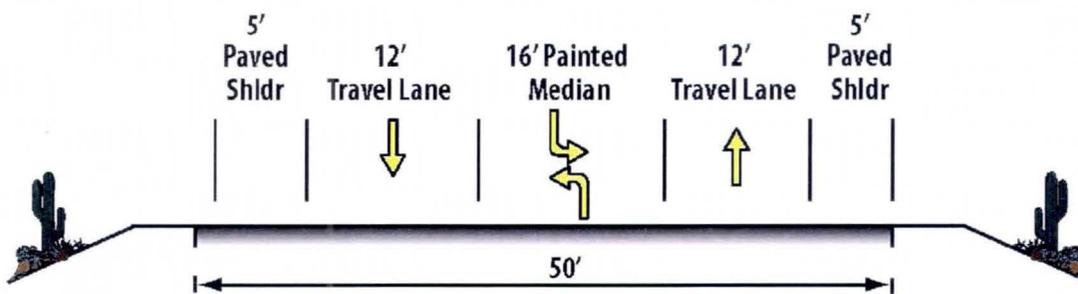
Interim Cross Section: Lost Dutchman Boulevard to Germann Road
